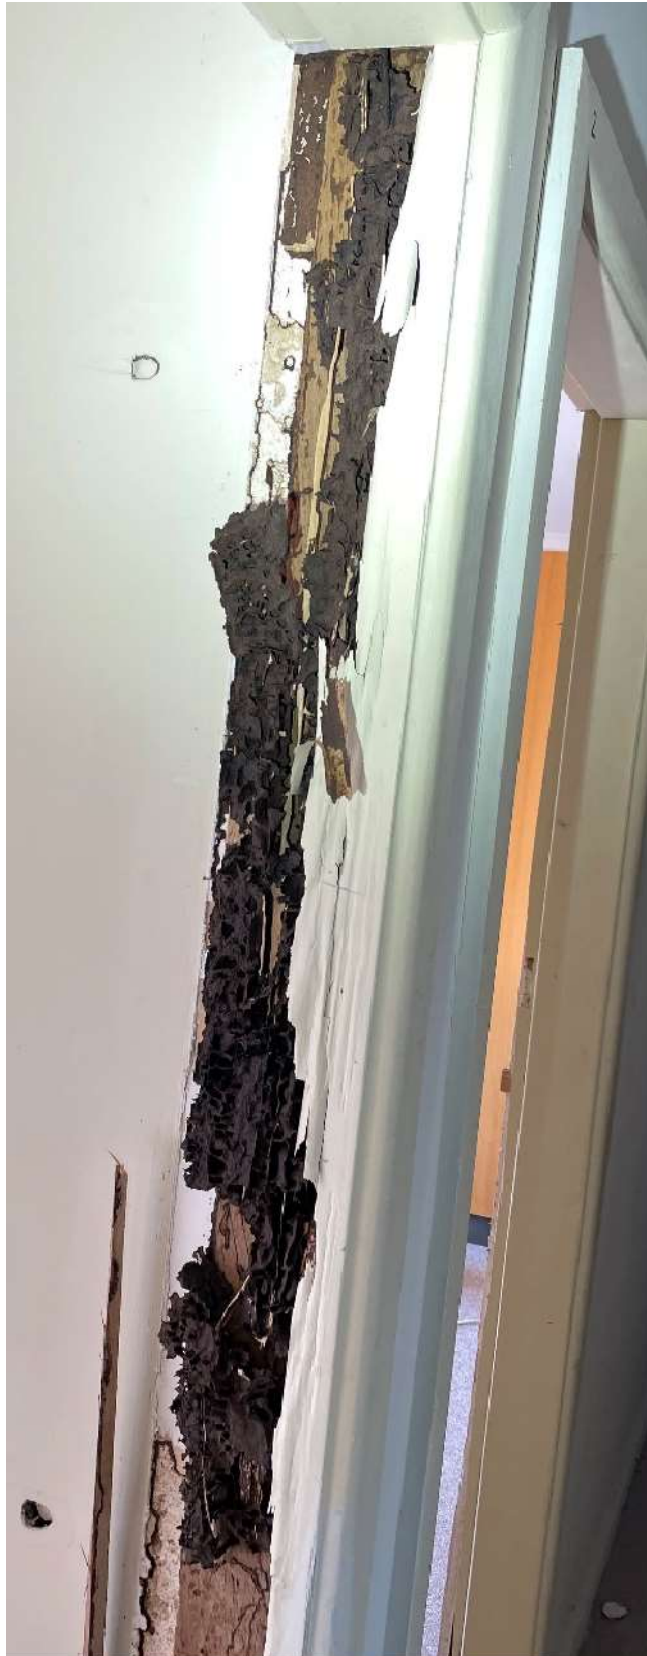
Timber Casing around door-frame severely damaged from termites.
